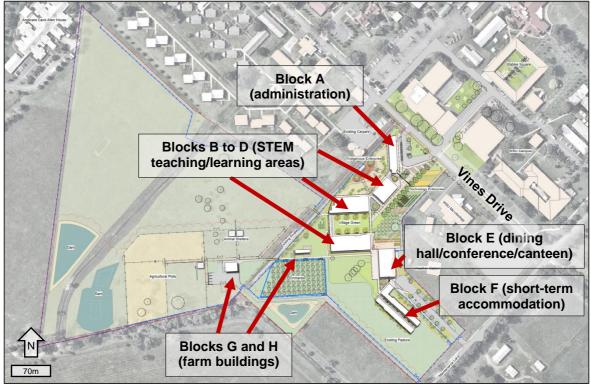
| Site Plan (Source: Applicant's RtS 2021)
